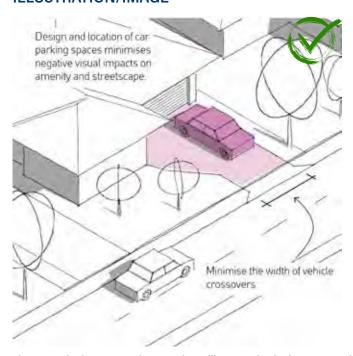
Single House and Grouped Dwellings - Setback of Garages and Carports Example Diagram
